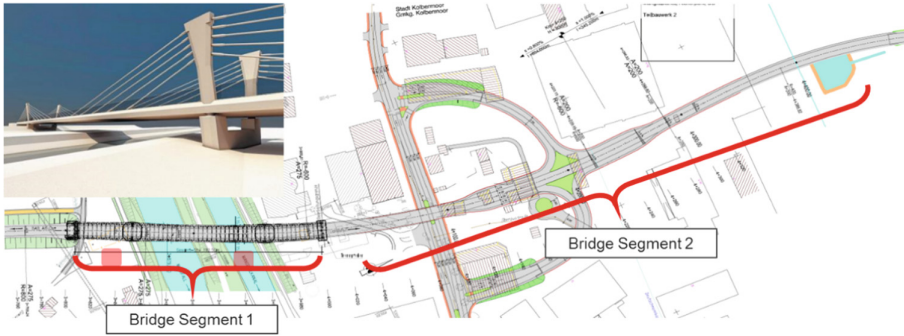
Bridge structures crossing over the Mangfall river, Mangfall canal, the Aicherpark industrial estate and the Holzkirchen - Rosenheim railway line: Bridge Segment 1 (Mangfall bridge): Ingenieurbüro Grassl GmbH (Structural design) | Reinhart + Partner Architekten und Stadtplaner (Visualisation); Bridge Segment 2 (Aicherpark bridge): SSF Ingenieure AG (Structural design).
